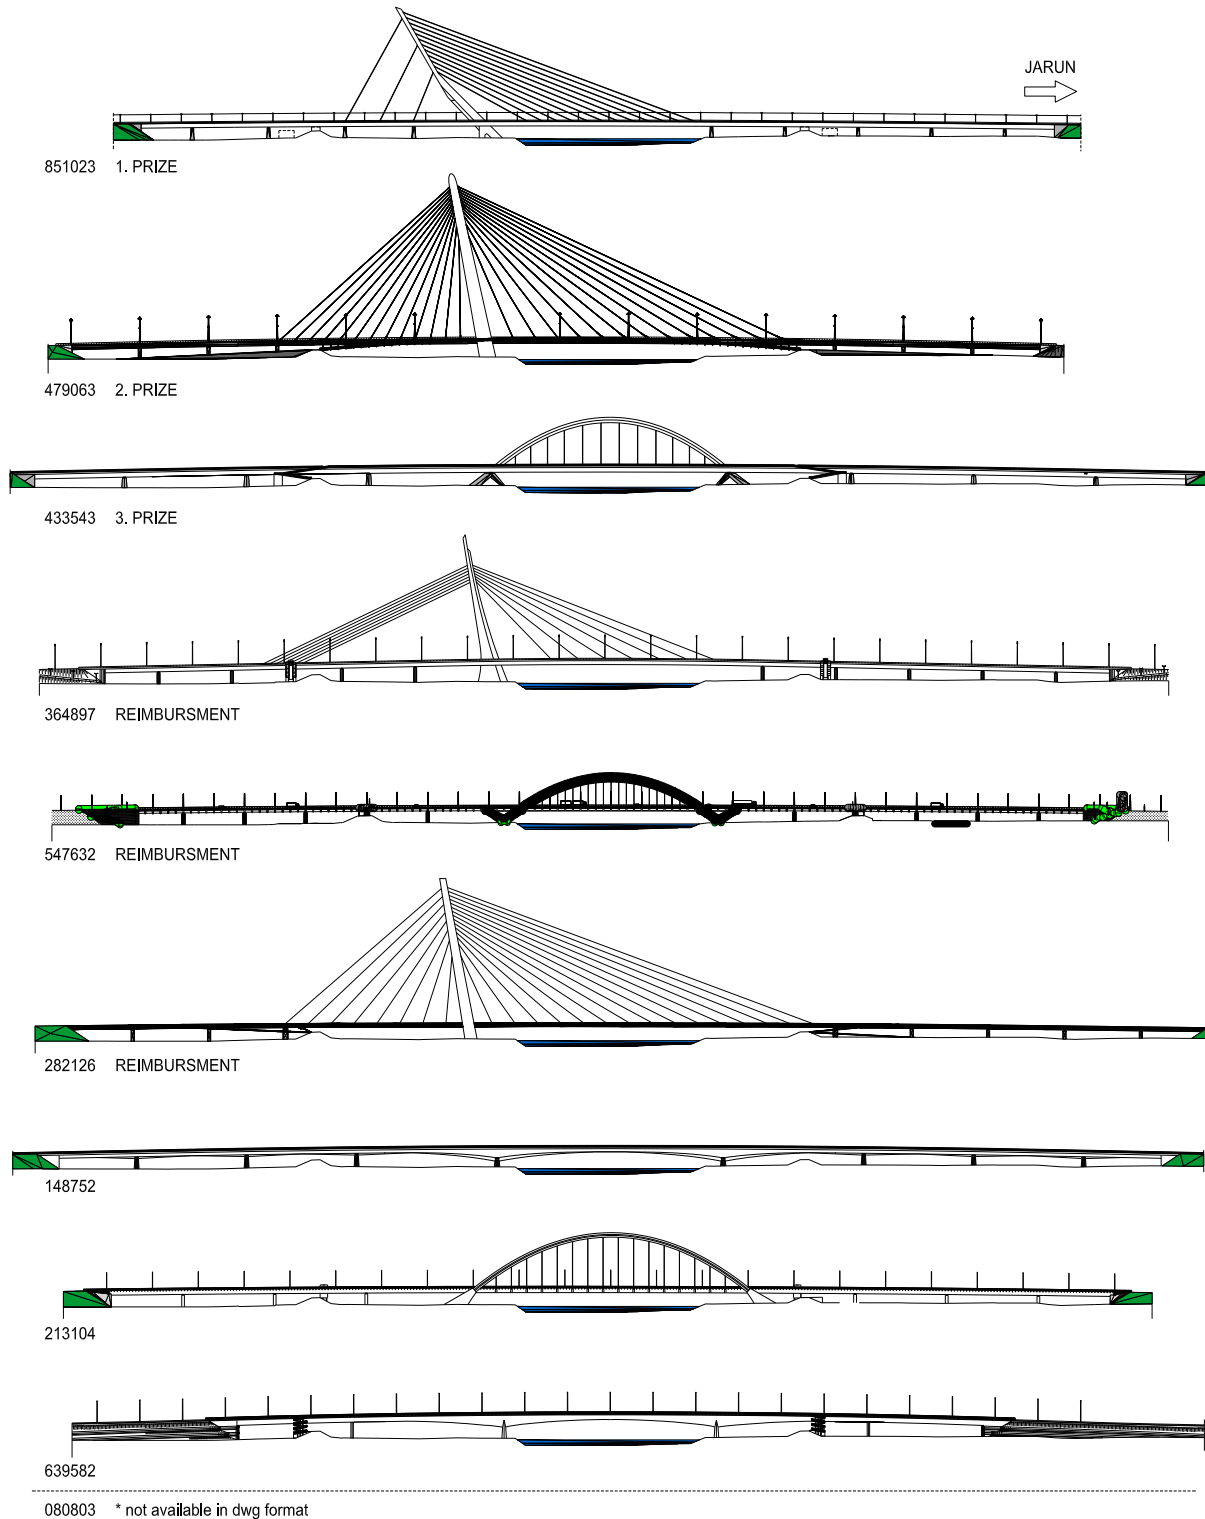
Longitudinal sections of alternative Jarun Bridge structures
